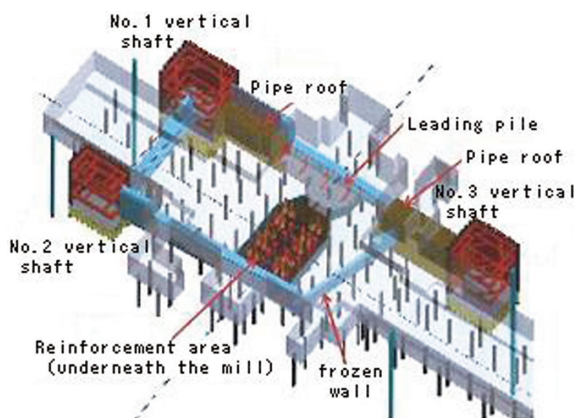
Foundation repair work by underpinning method for operating equipment / Overall schematic of temporary work
